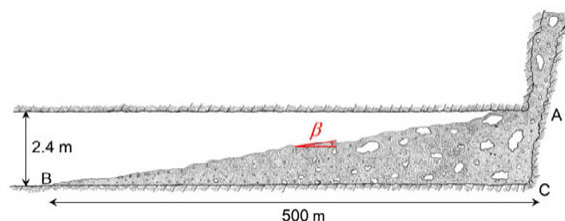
Longitudinal section of the floor adit with dimensions of the collapse (Theiler et al., 2013)
